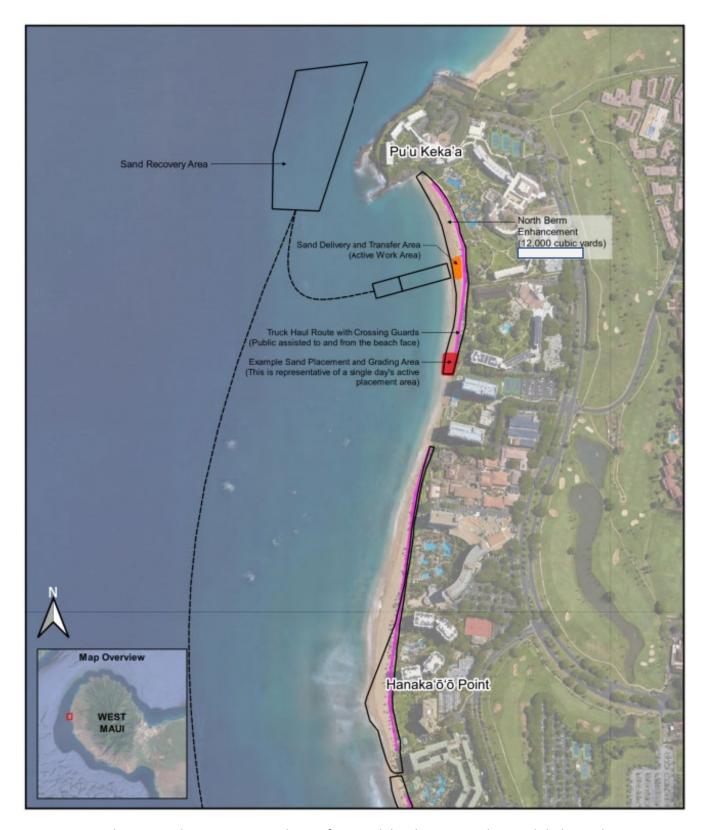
North Berm Enhancement sand transfer, truck haul route, and typical daily work area.
